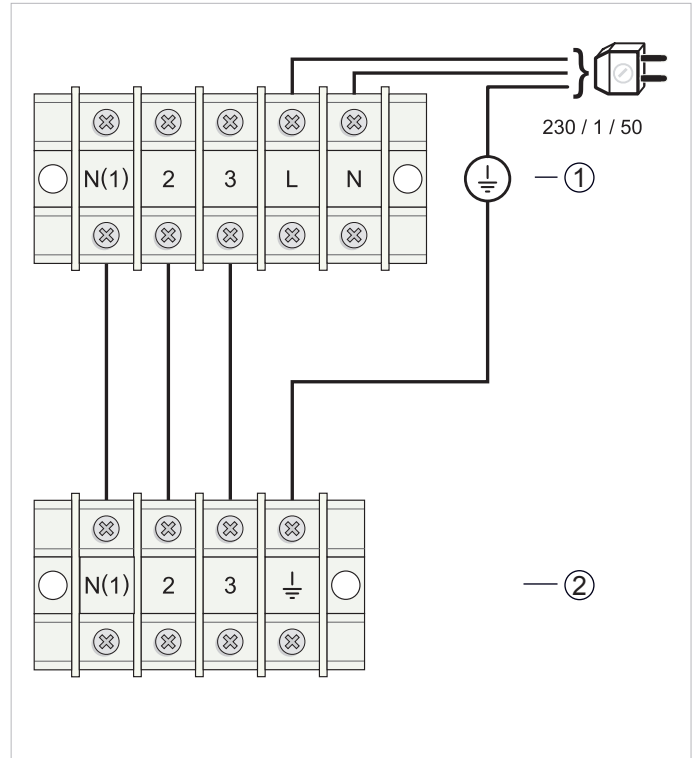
Electrical layout for outdoor and indoor connection SDH 18-050 NW.
